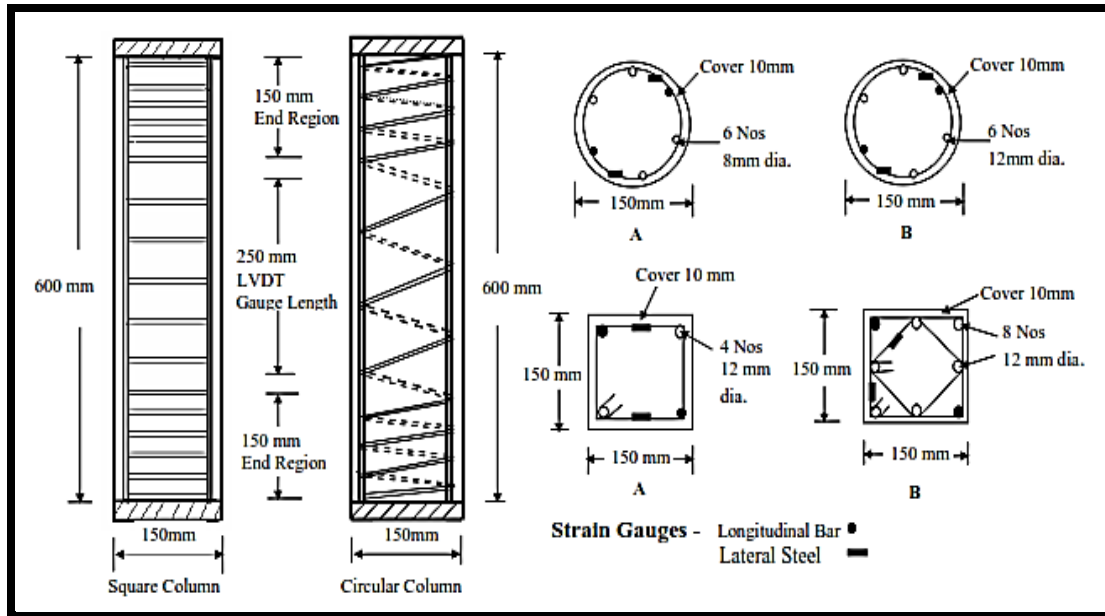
3. Details of column specimens, reinforcement arrangement and location of strain gauges (Sharma et al. (2005))
